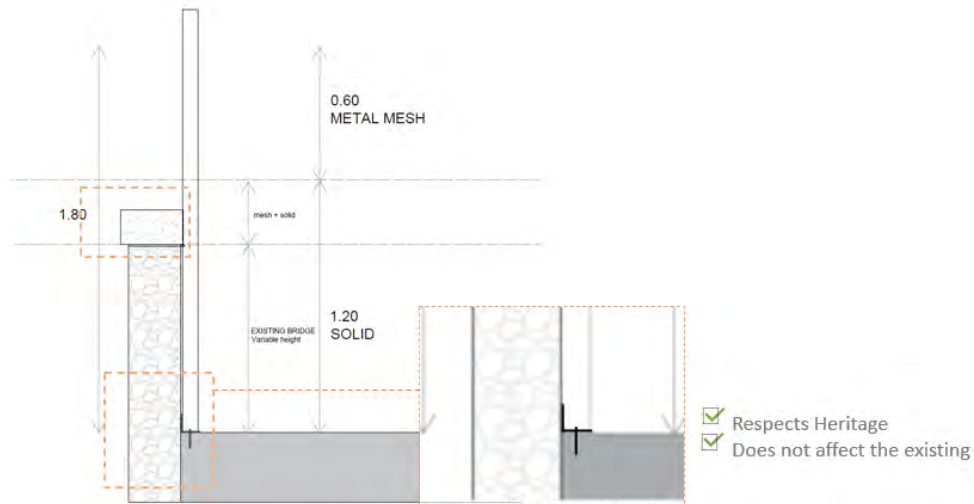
Design intent for parapet heightening on bridges - foundation and support detail
